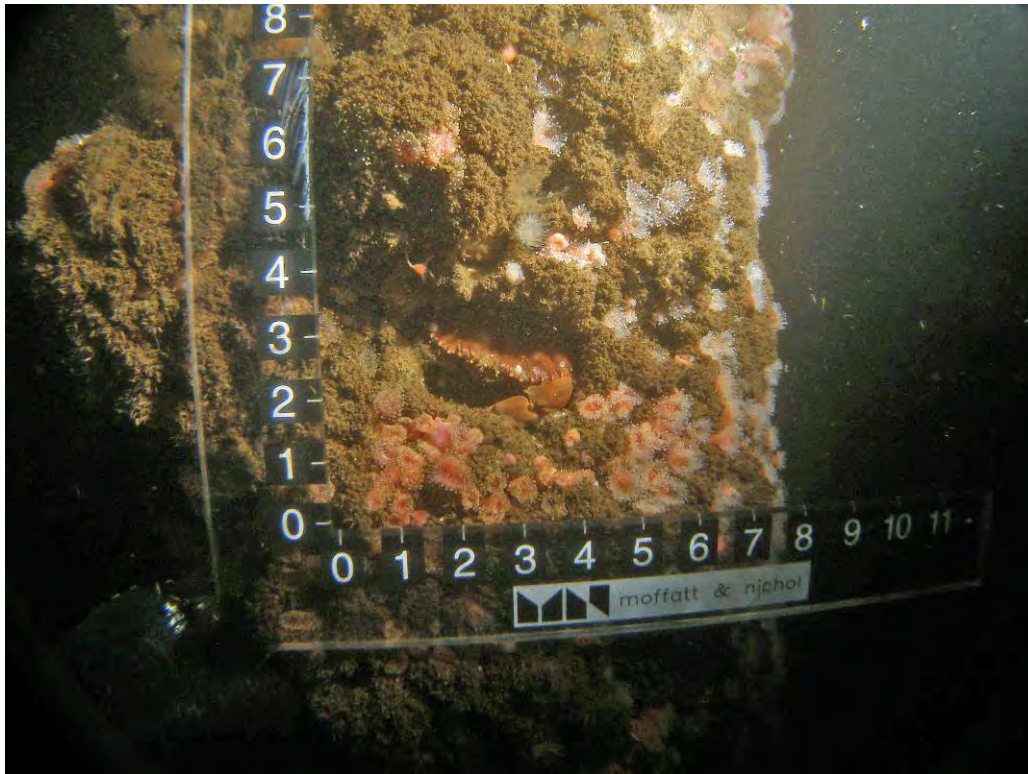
Bent 76, Pile 14 – Portion of pile with 80% section loss (Deep hollow hole with crab living inside)
